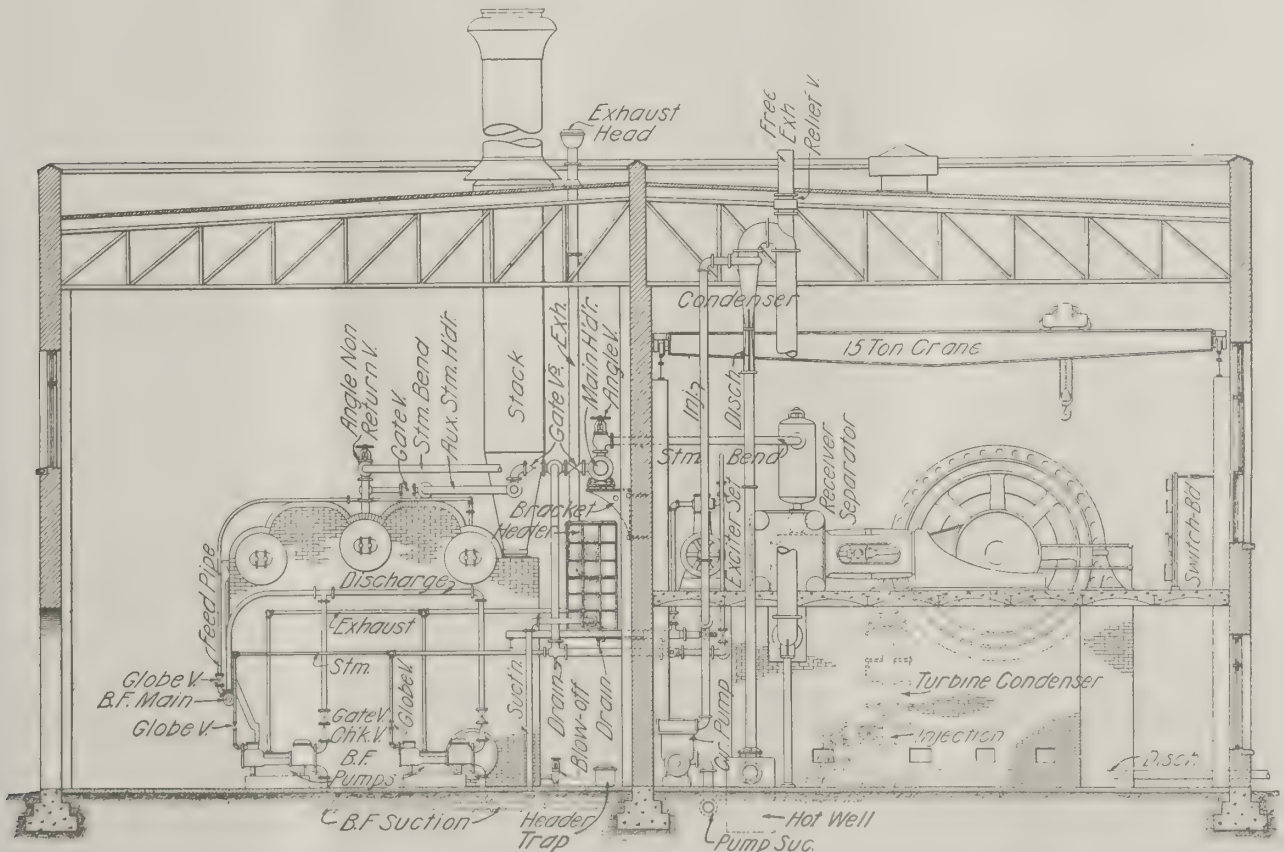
ELEVATION OF POWER PLANT UNDER DISCUSSION.
